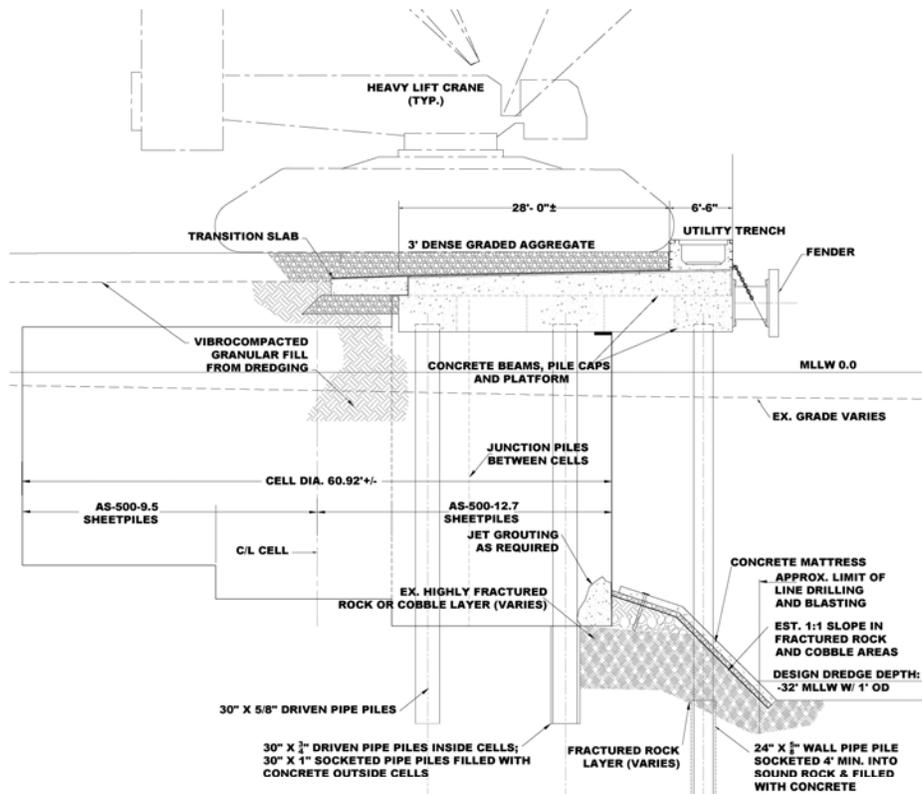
Final design section of deeper draft bulkhead (dredging to -32, stepped circular cells, overhanging pile supported platform and toe scour protection).
